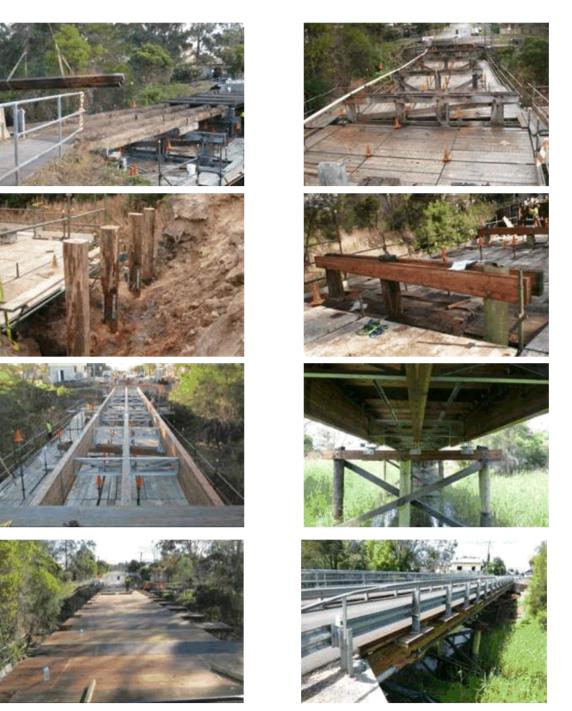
Replacement of Bob Wells Bridge in Cessnock, NSW. The original superstructure and deck were removed, the substructure was restored utilizing high strength fibre wraps on the timber piles, and prefabricated Penta-treated glulam girders and deck were installed. The completed system has a life expectancy of 75-100 years.
